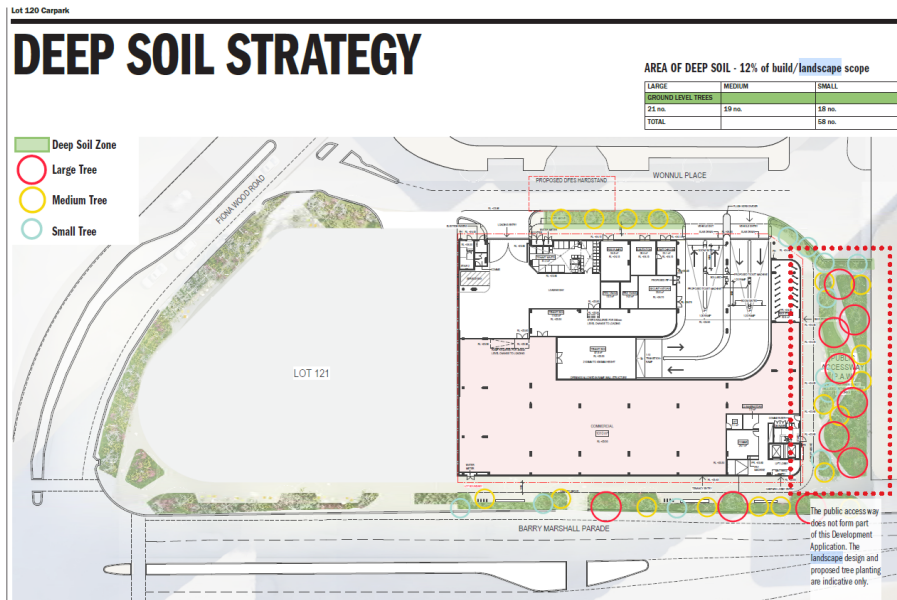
Proposed Verge Landscape Plan adjoining Lot 120 and indicative Public Accessway Landscaping on Lot 122
